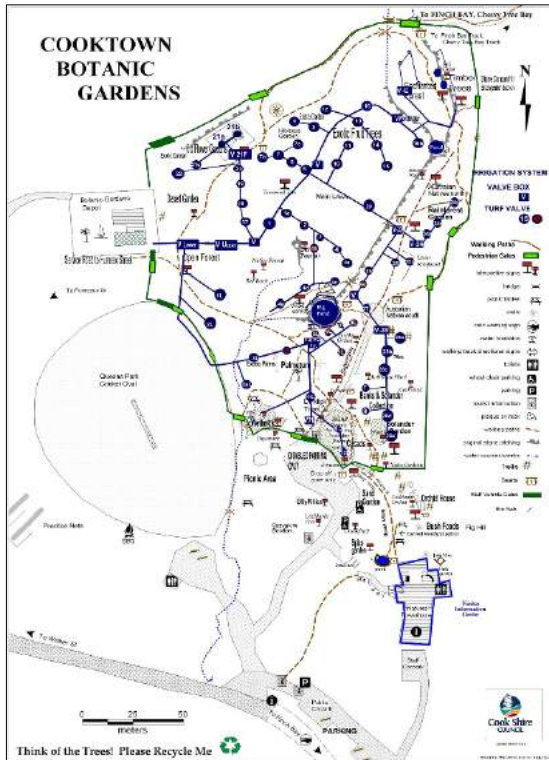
Irrigation layout in 2014 (Refer to Appendix C For a full-size plan)
